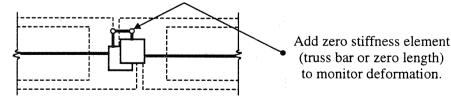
MODEL OF BEAM-TO-COLUMN CONNECTION
